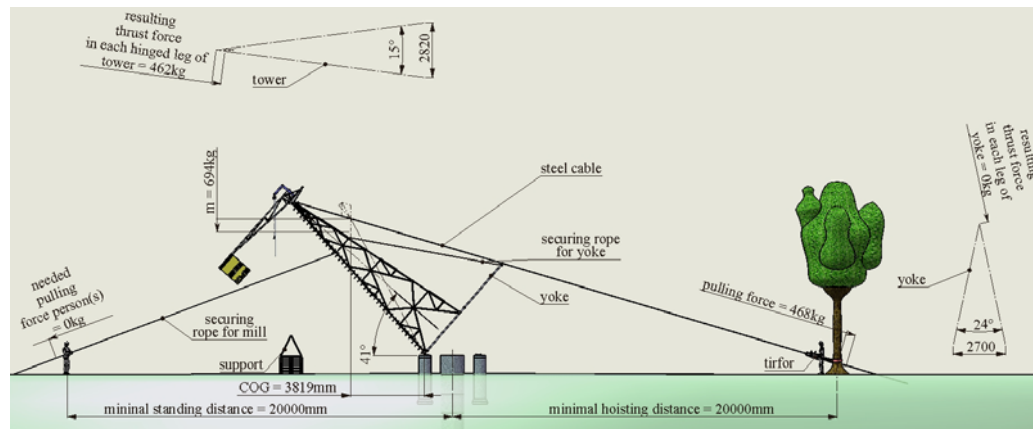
hoisting Diever 450 (galvanized), without rotor, but with jib, chain hoist, head, tail, tumbler, (part of) pumprods, load limiter and shock absorber
